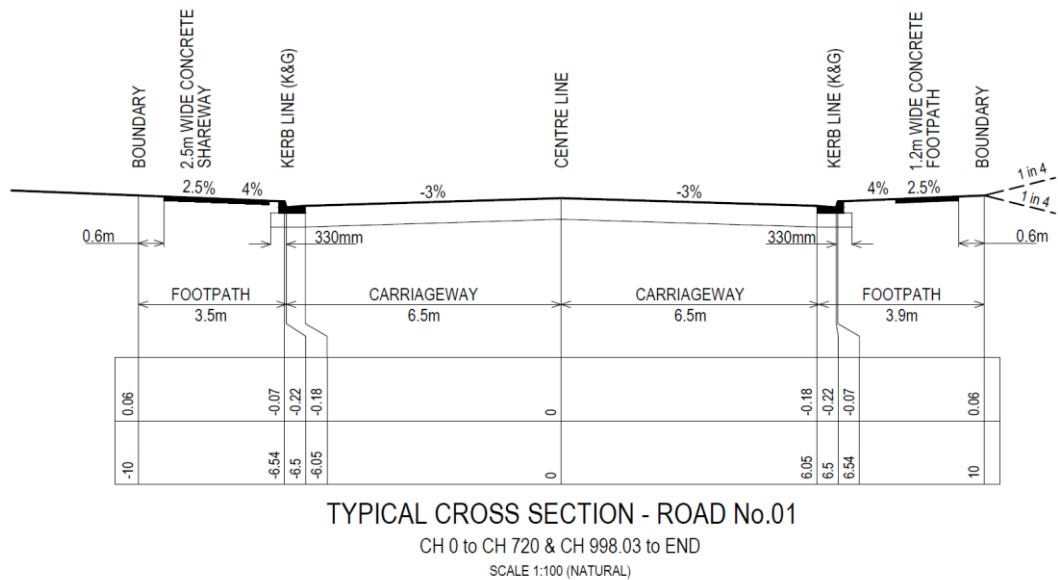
Estate Road – Typical Cross Section (as adopted)
